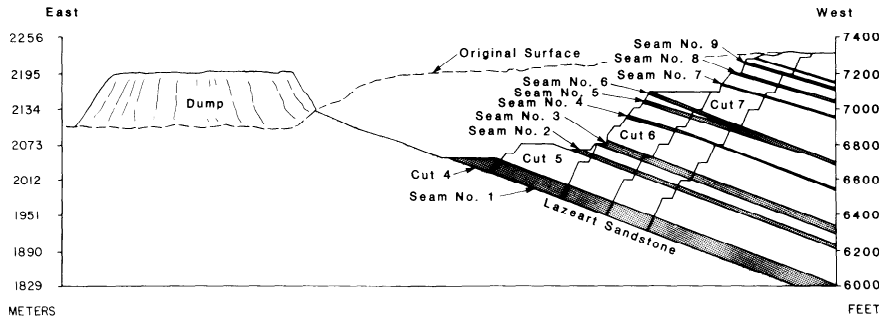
Typical cross section through the 1-UD pit.
